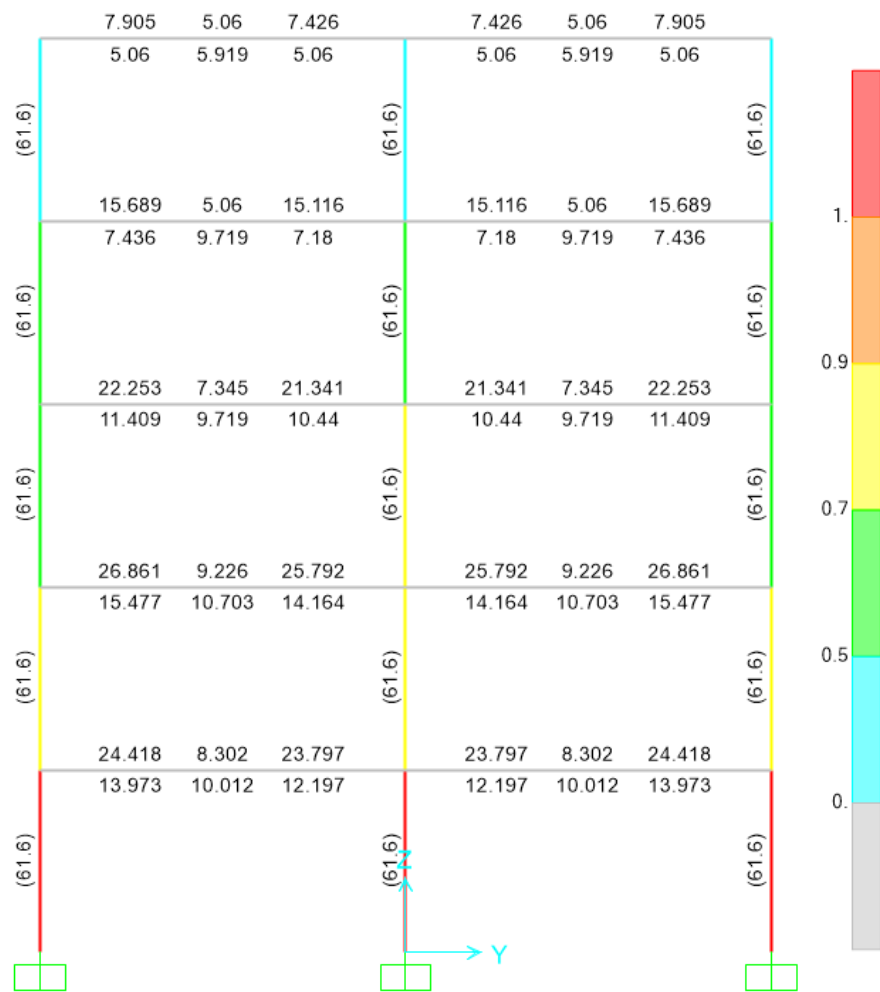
Check of demand/capacity ratio for columns in the most external transversal frames, maximum amount of required rebars in the beams (in cm², on the second floor).
